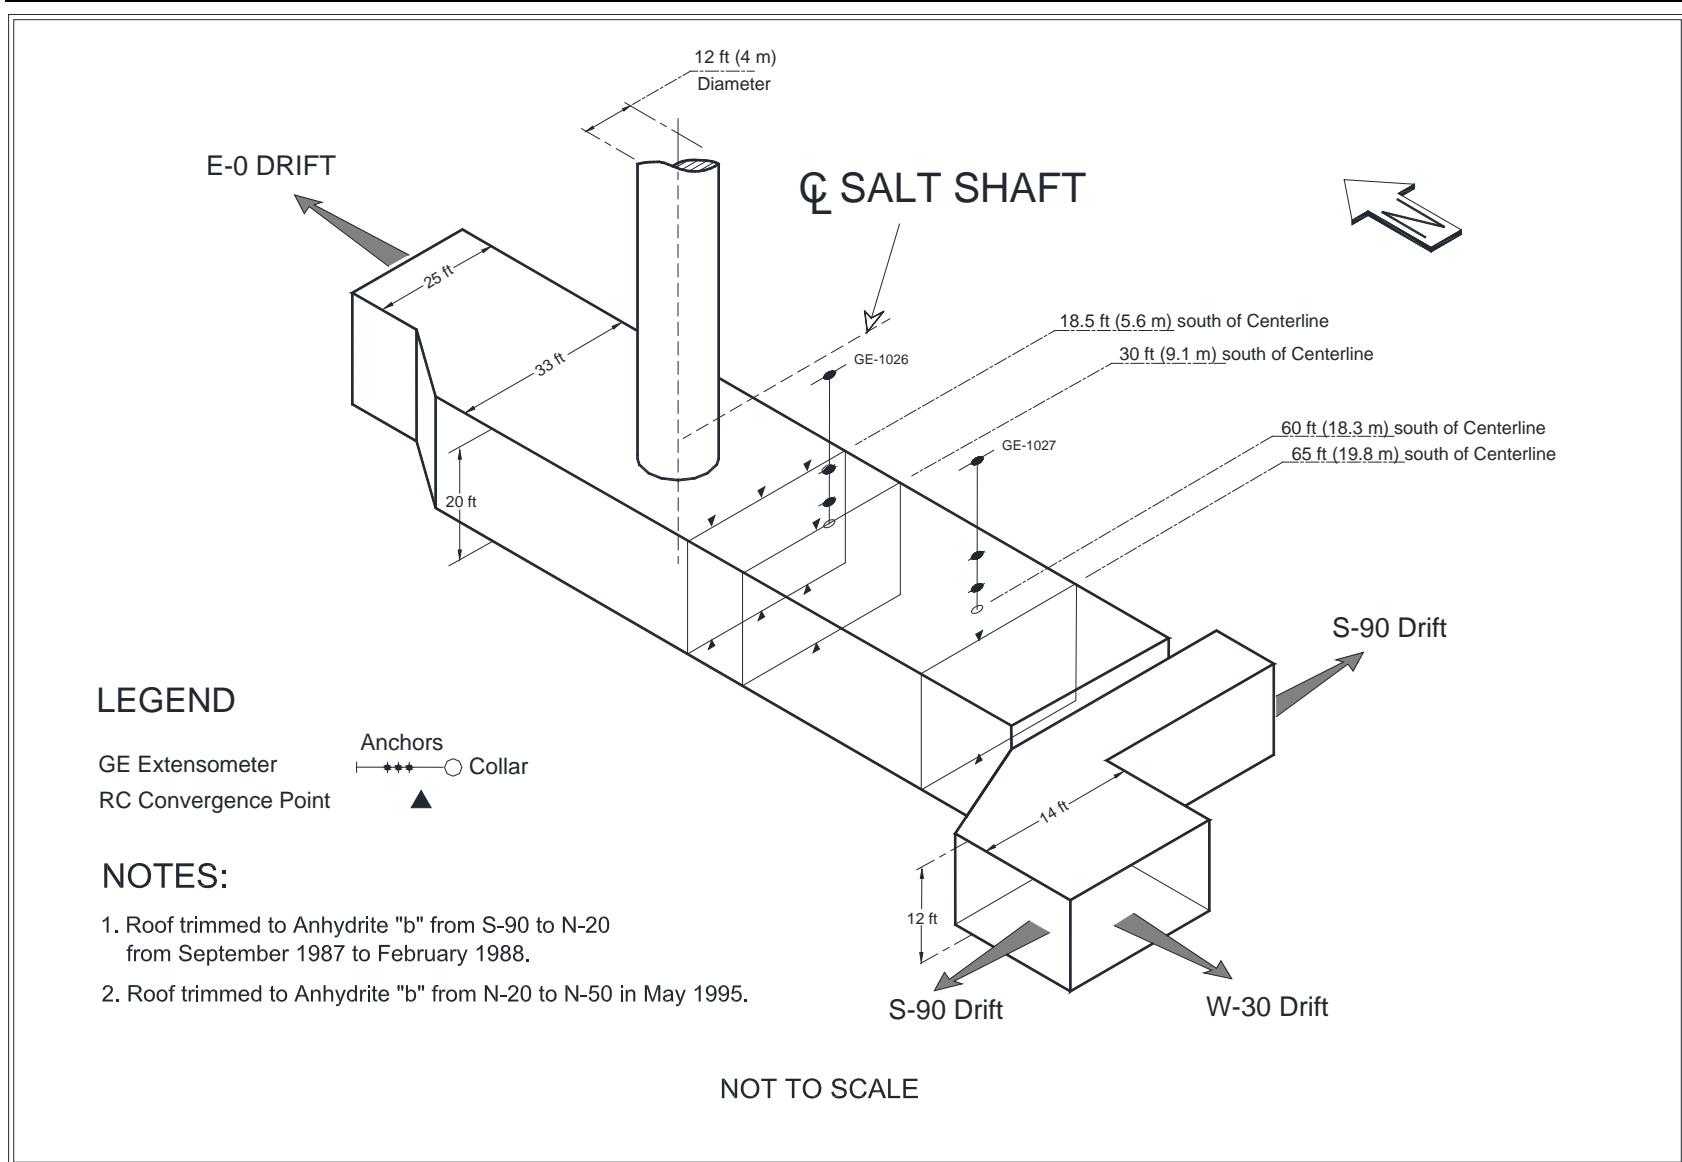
2 Salt Shaft Station Instrumentation after Roof Beam Excavation
